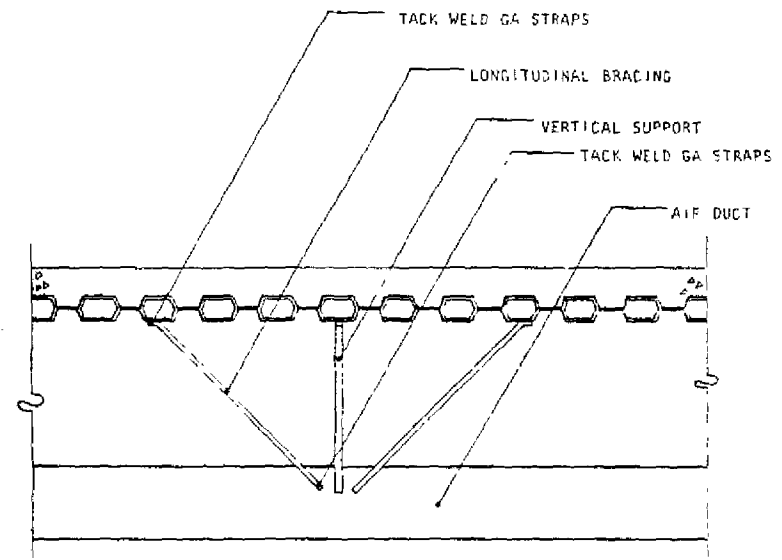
Air handling systems. Air duct suspension and longitudinal bracing.
